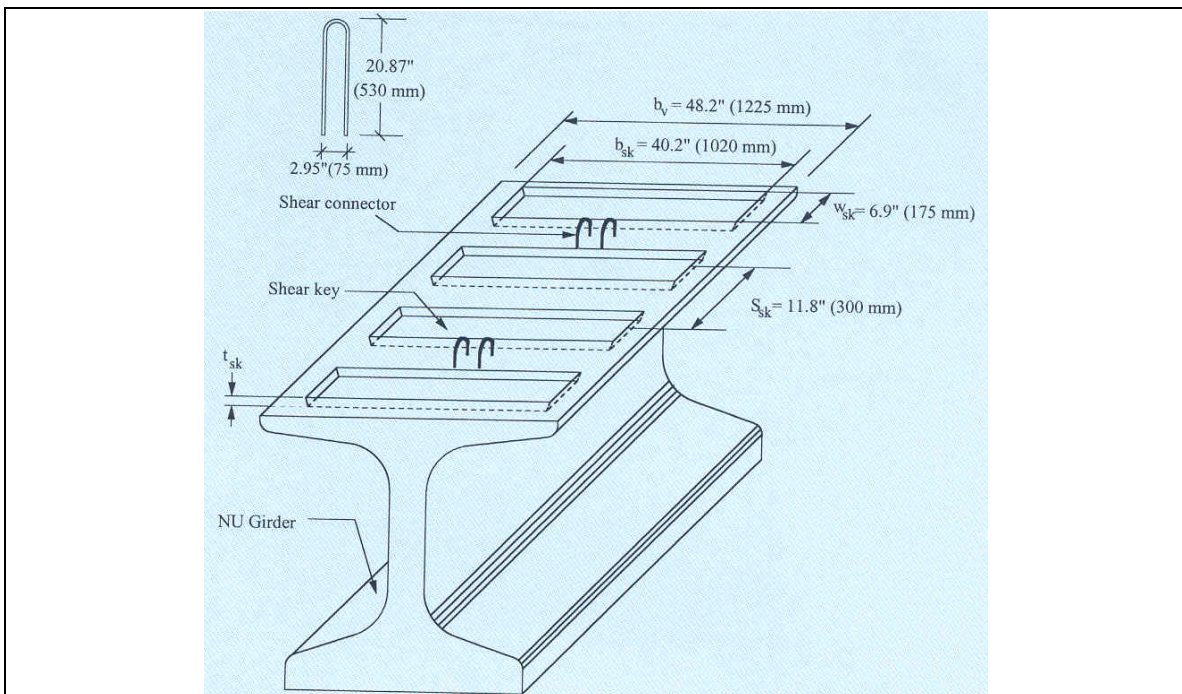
Modified debonded shear key connection system (Tadros et al., 2002)
